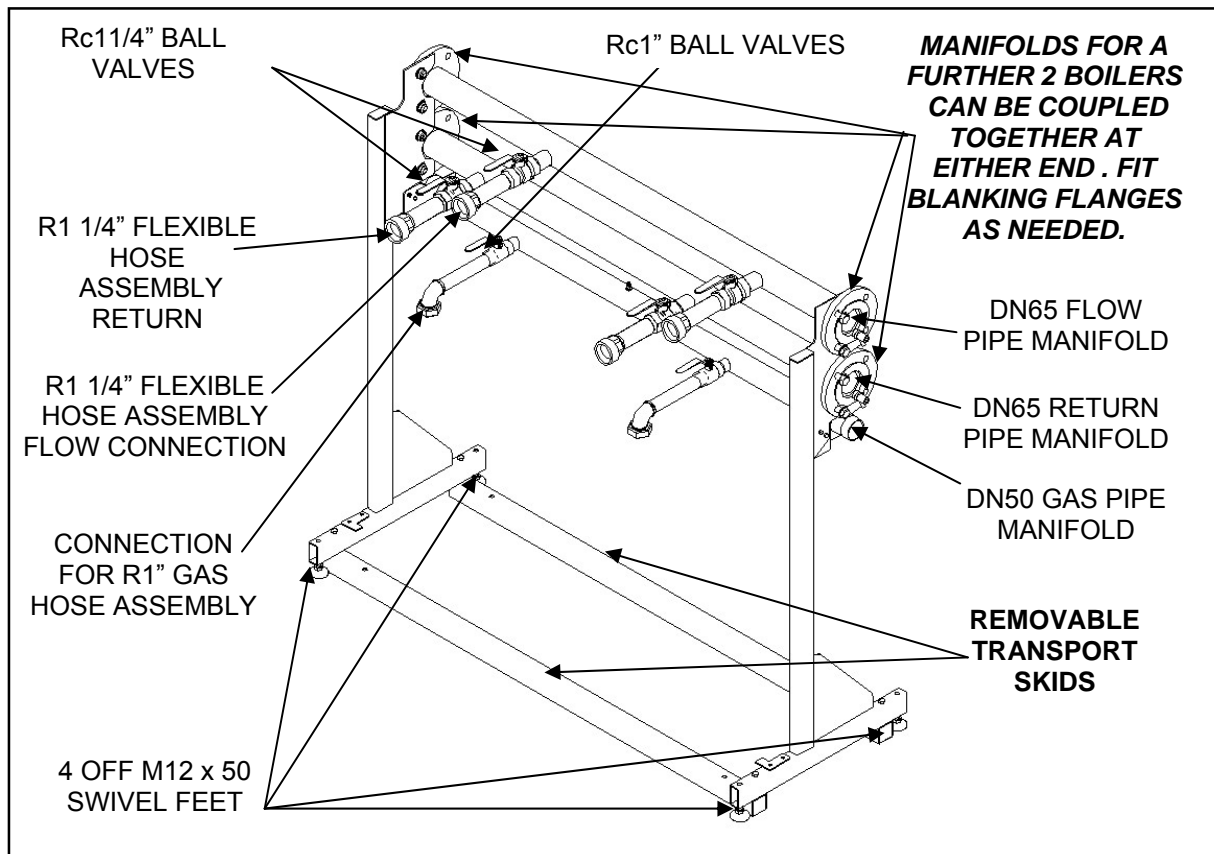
562702210 - Pipe Kit Manifold Assembly As Delivered
